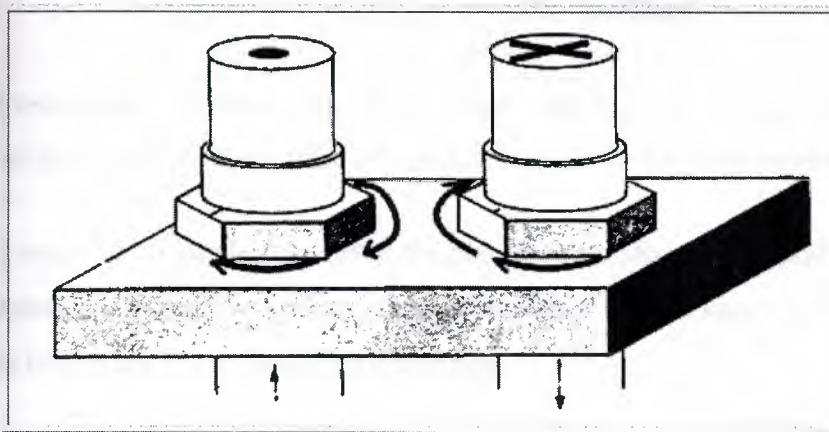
Iron losses when single-core cables enter a steel enclosure through separate holes
